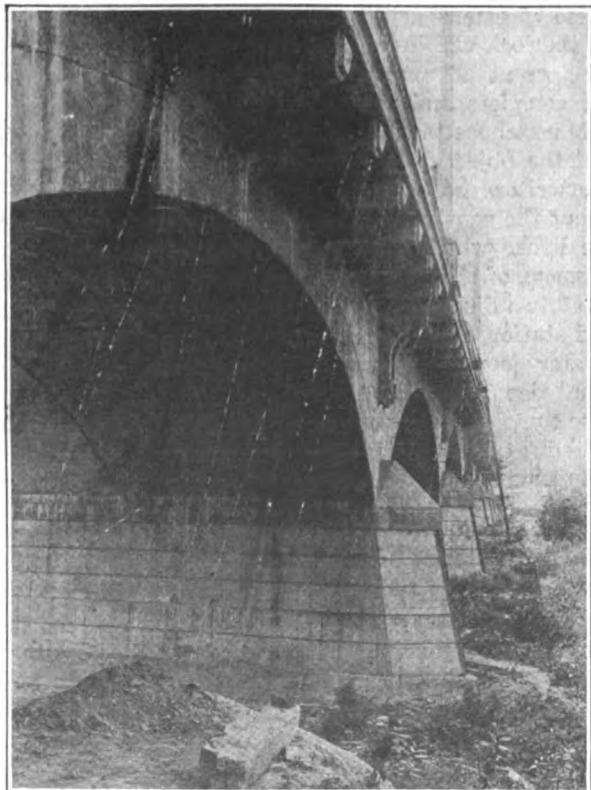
LOOKING ALONG THE SEVEN SPAN MEMORIAL BRIDGE AT CORNING, N. Y.
